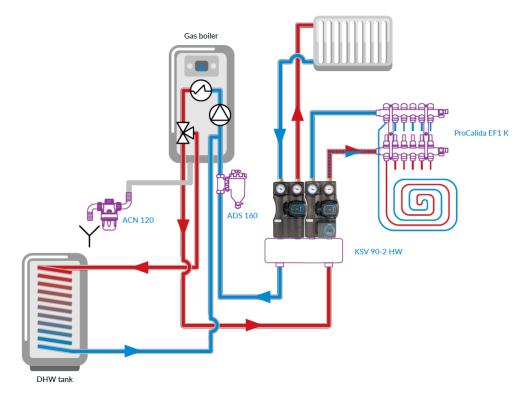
BPG assemblies mounted on a KSV 90-2 HW boiler manifold with integrated hydraulic separator in a mixed system with a gas boiler
